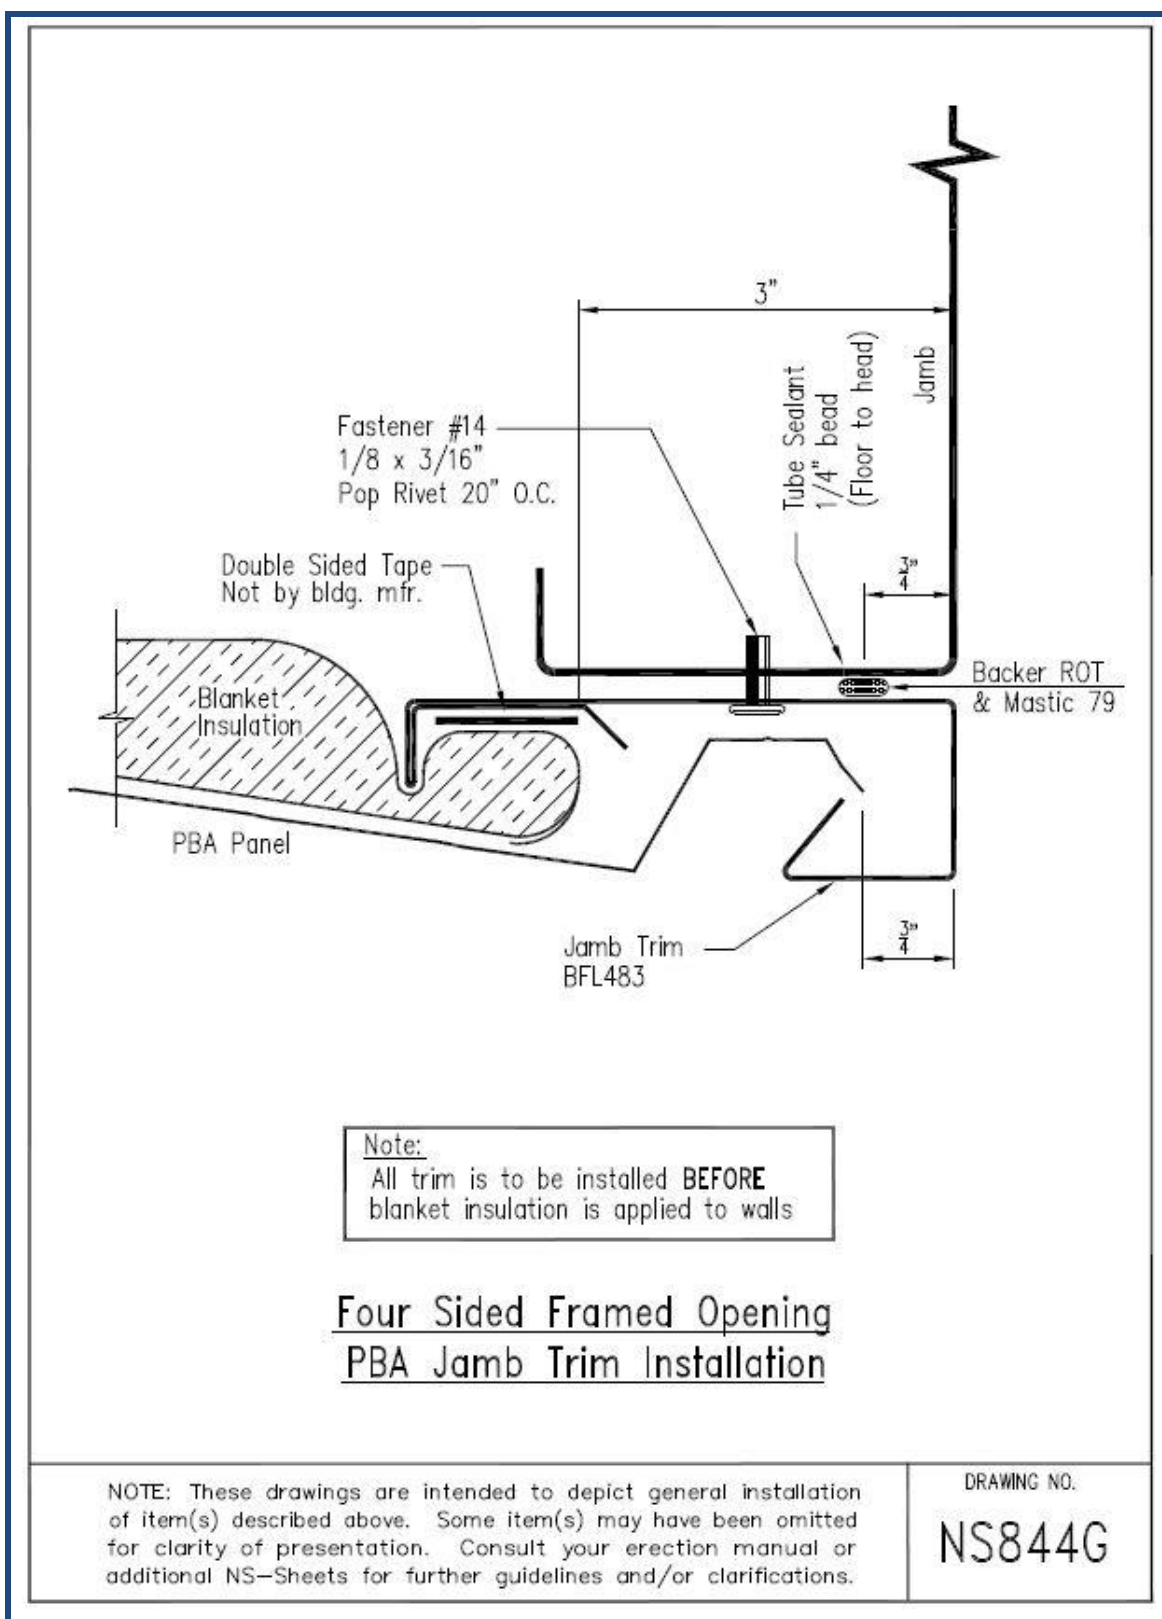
Four Sided Framed Opening Jamb Trim Installation Detail
